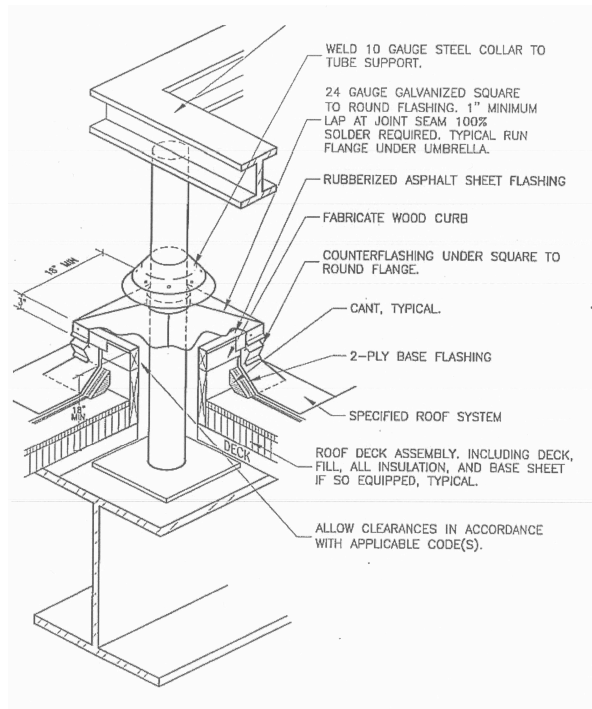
TYPICAL ROOF SUPPORT DETAIL FOR ELEVATED PLATFORM
